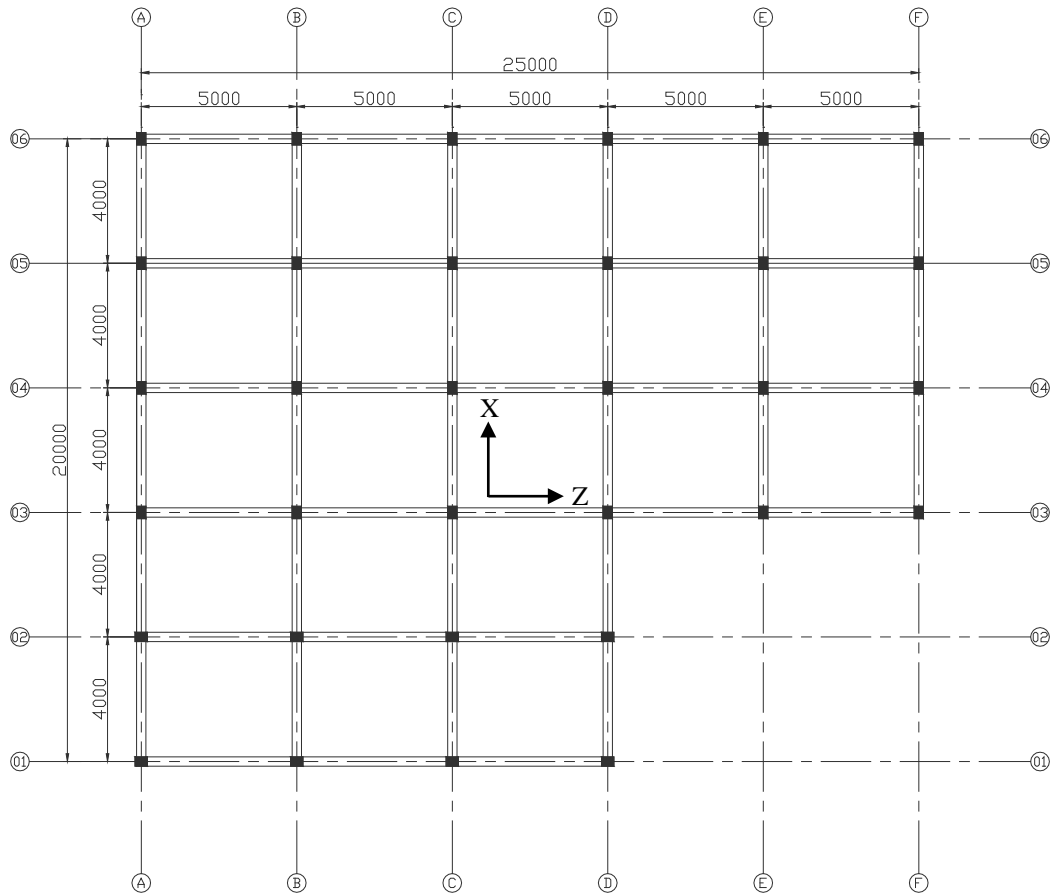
Plan of two, six, and twenty-story irregular RC buildings (all dimensions are in mm)
